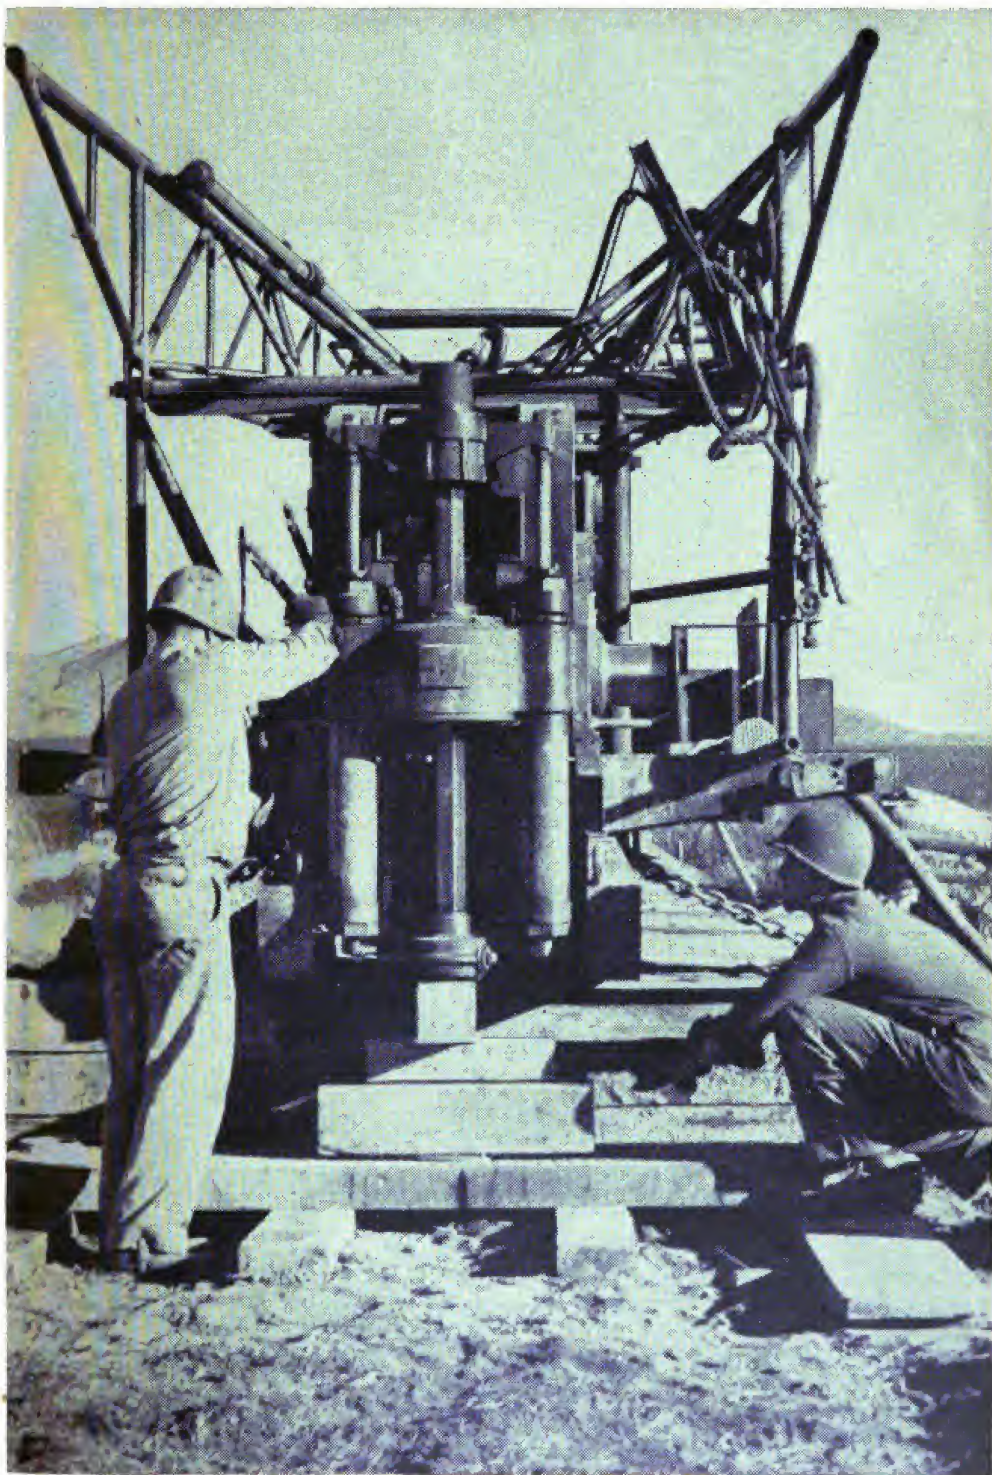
Placing cribbing under rear of rotary-drilling machine.
